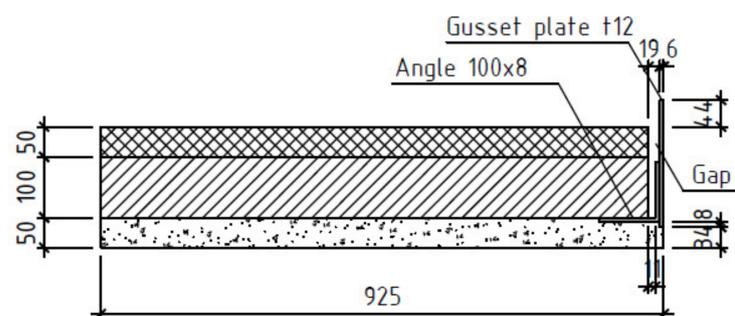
Calculation scheme with a gusset plate. The gaps between the angles and precast reinforced concrete elements are not filled with thermal insulation (units: mm).
